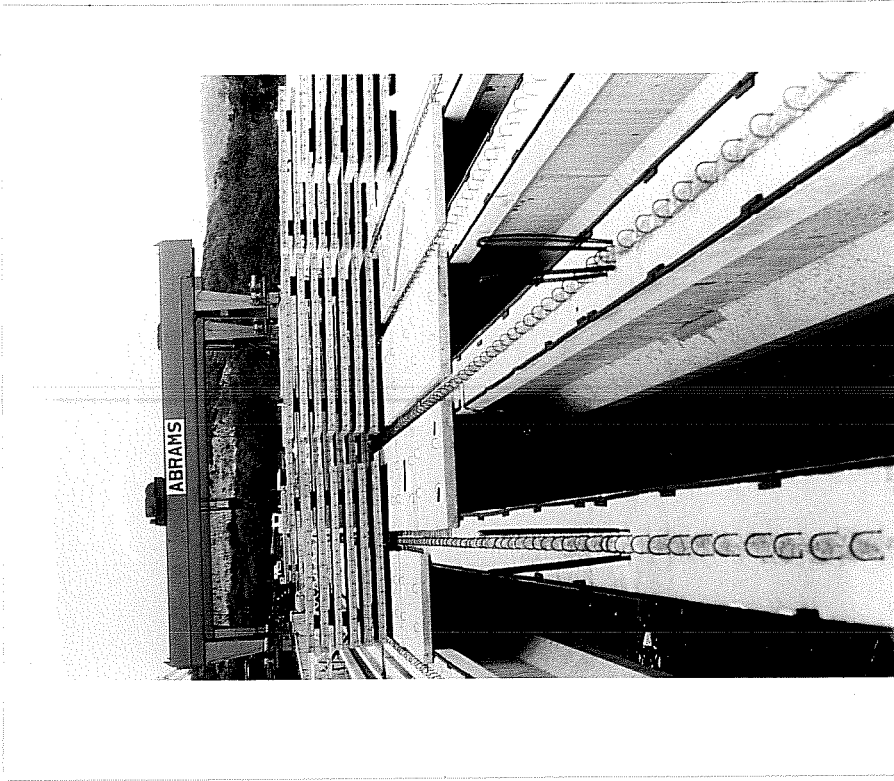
Fiberboard glued to the top of beams before placing deck panels
